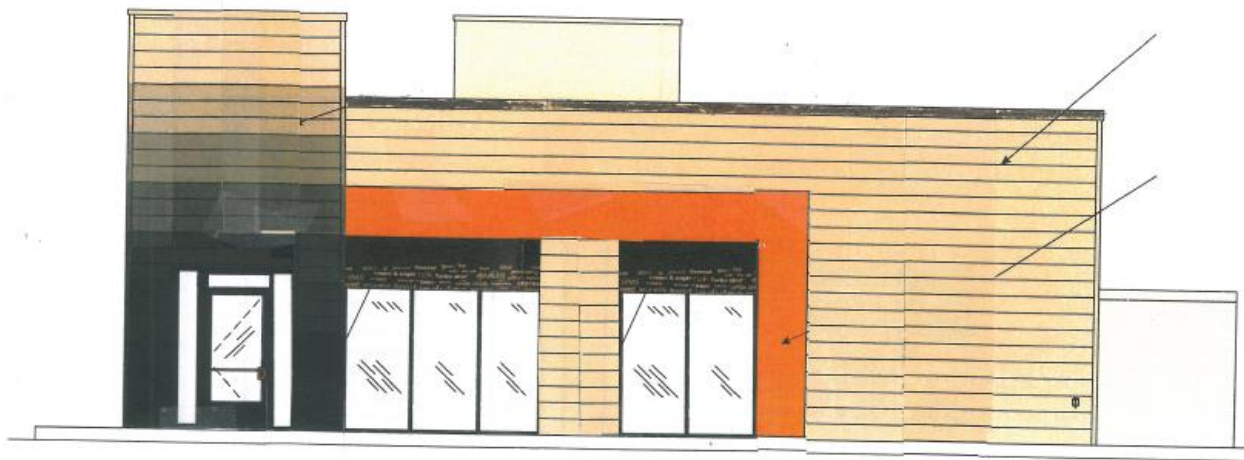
Proposed revisions to the Side (east) Elevation facing the parking area.
